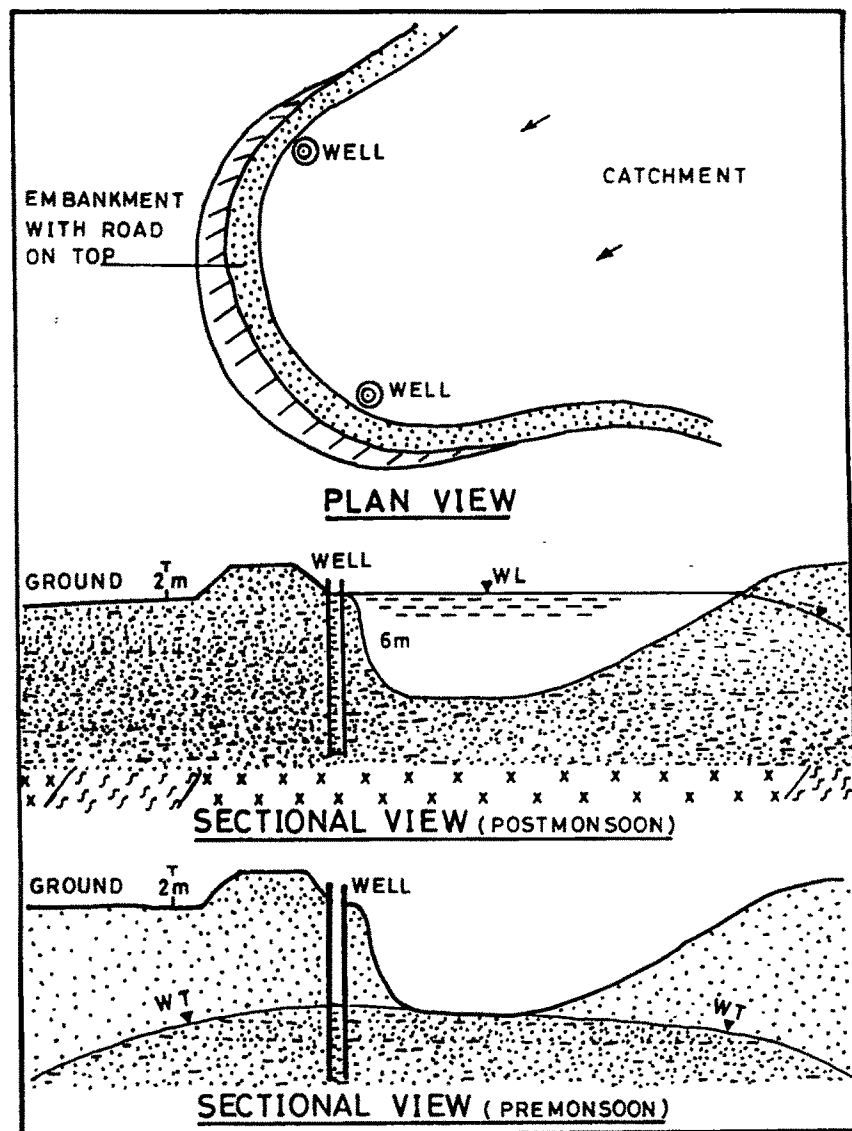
SCHEMATIC DIAGRAM OF VILLAGE POND
